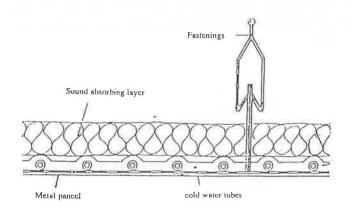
Metal ceiling panels with cooling mat and insulation (Nickel).
